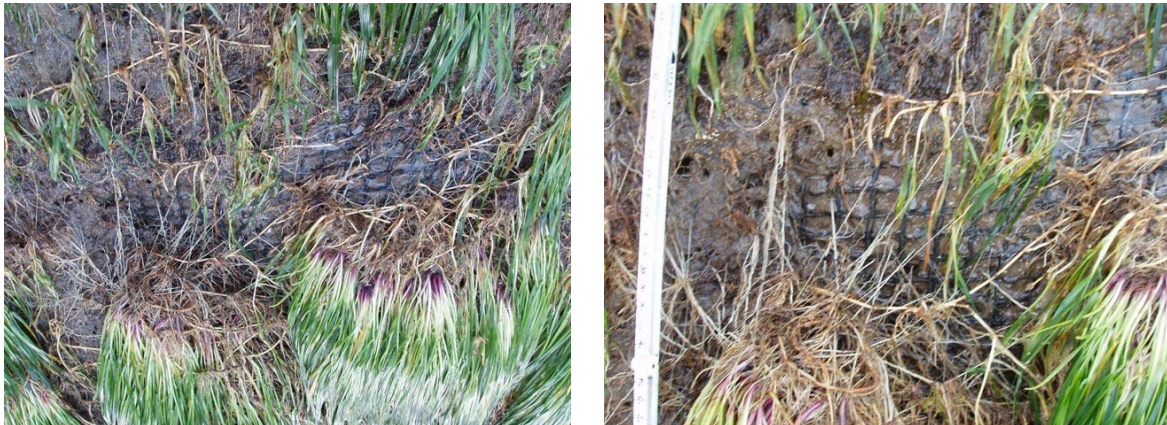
Detailed photographs of some bare spots after the 30 l/s/m test at the reinforced test section
